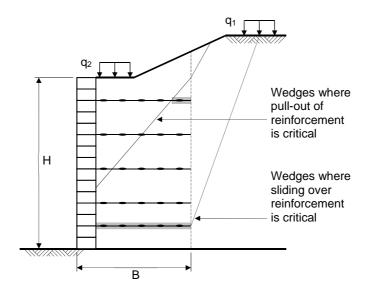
Interaction parameters for sliding over reinforcement and pull-out of reinforcement
